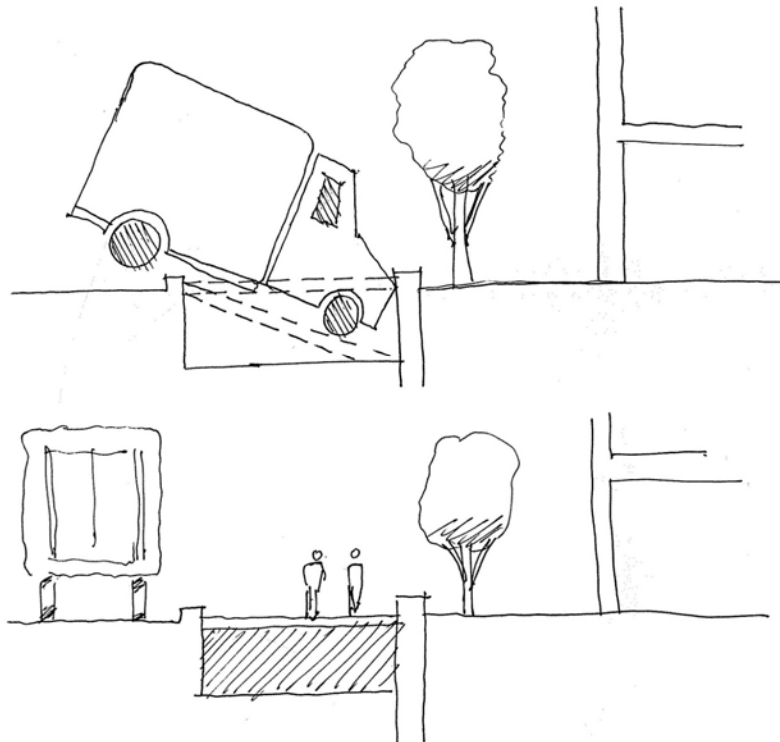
Break away sidewalk or "Tiger Trap". Image by author. "Engineering Security: Proactive Design for High Risk Buildings," 2009, 4.13.
